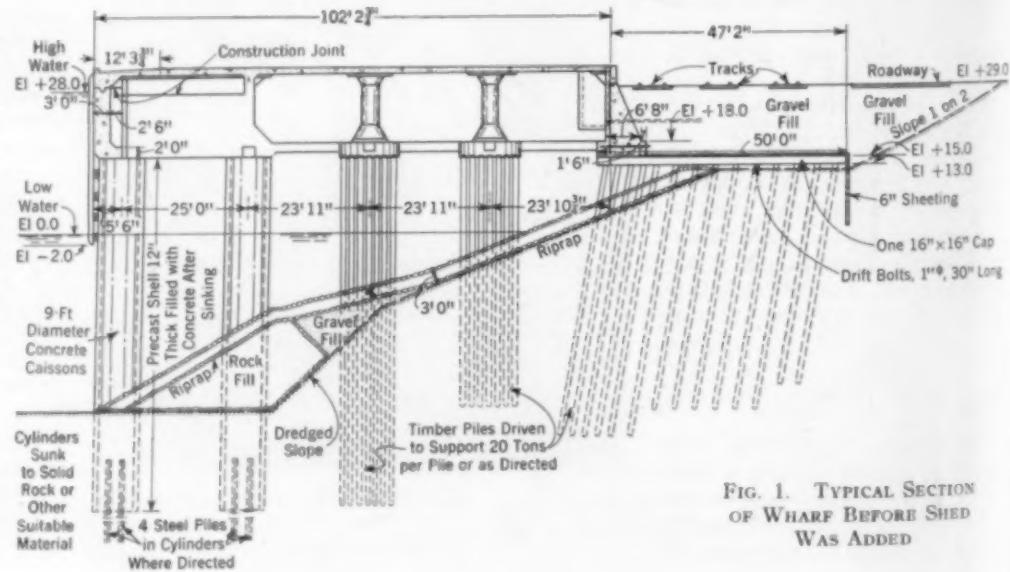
TYPICAL SECTION OF WHARF BEFORE SHED WAS ADDED
